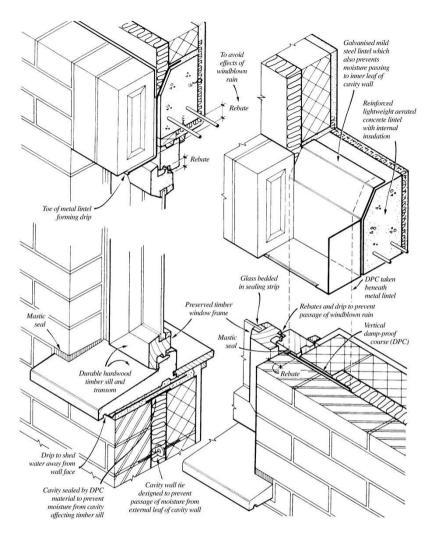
Some construction methods used to resist water and wind penetration through a window opening in a fully insulated brick/block masonry wall. Note: this diagram is representative of many existing constructions, but the lintel and reveal details no longer satisfy new-build thermal
